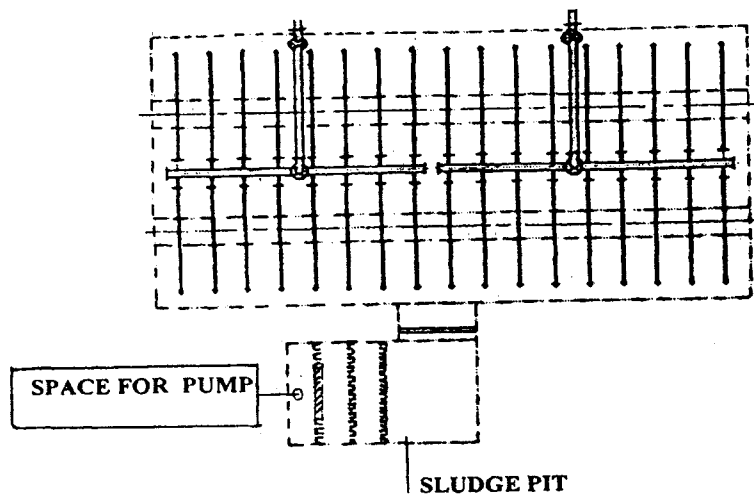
TYPICAL LAYOUT OF TESTING FACILITY
